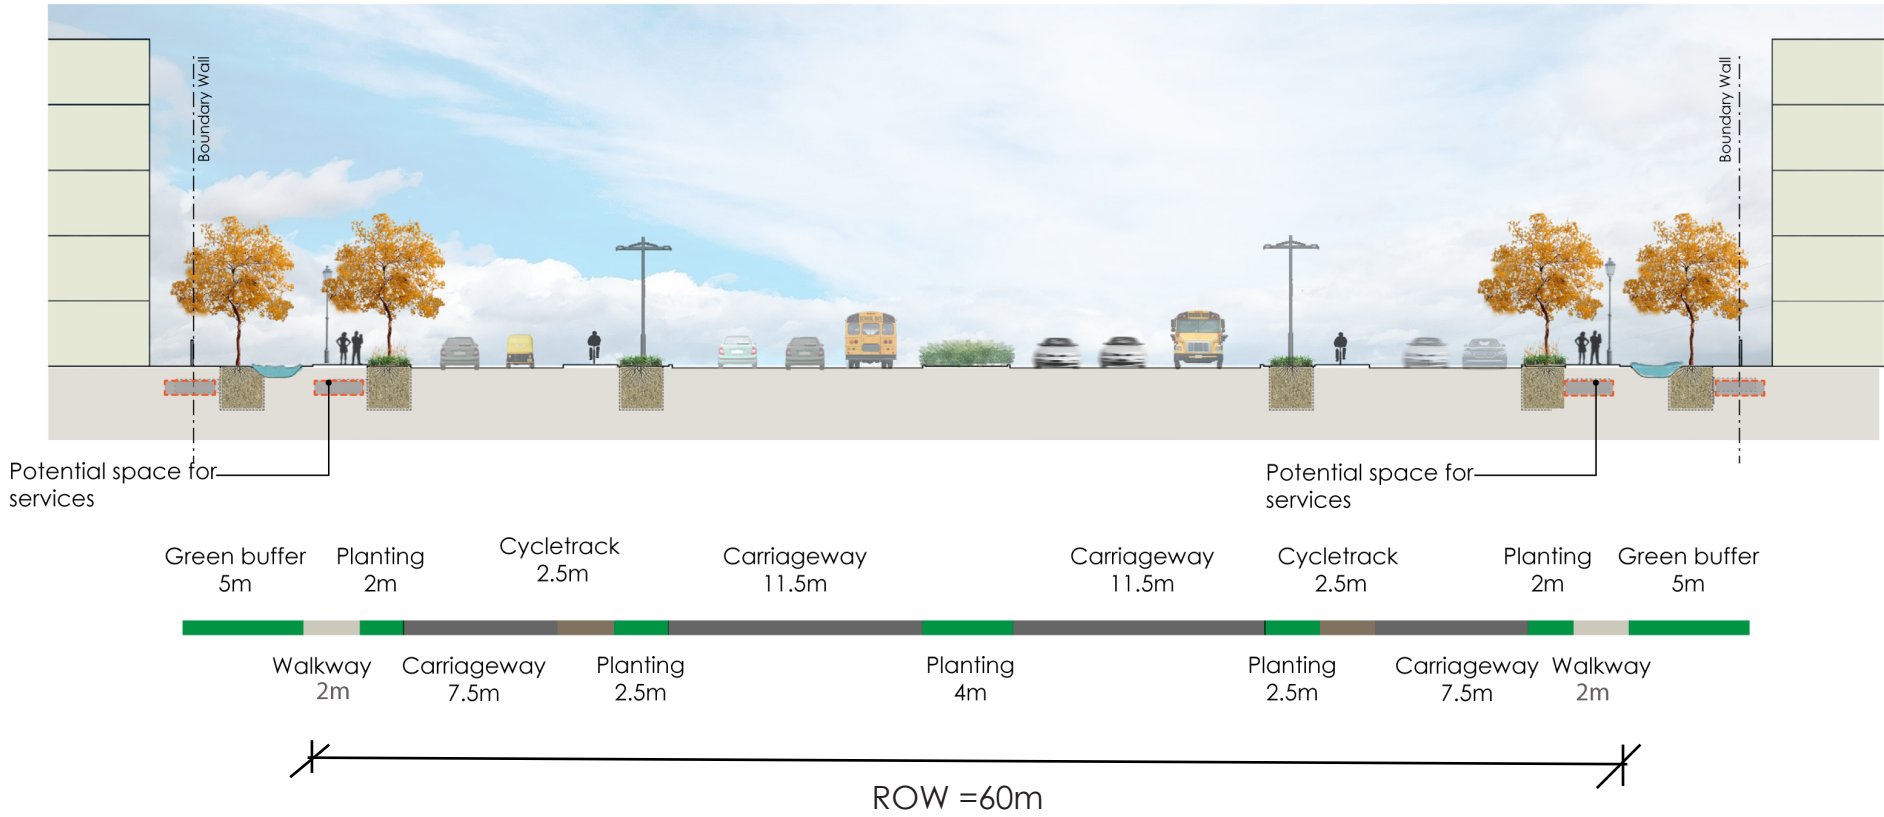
Proposed Typical Section 60 mts. ROW Road
